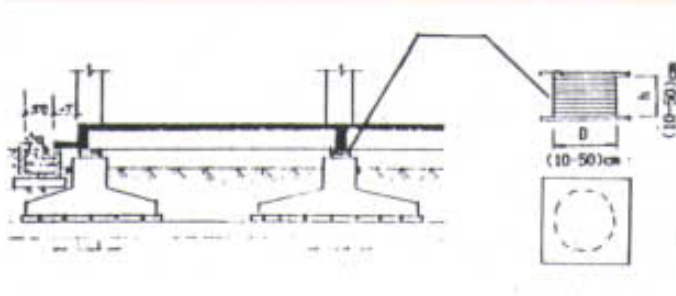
One 8 storied RC frame building with reinforced rubber pads
